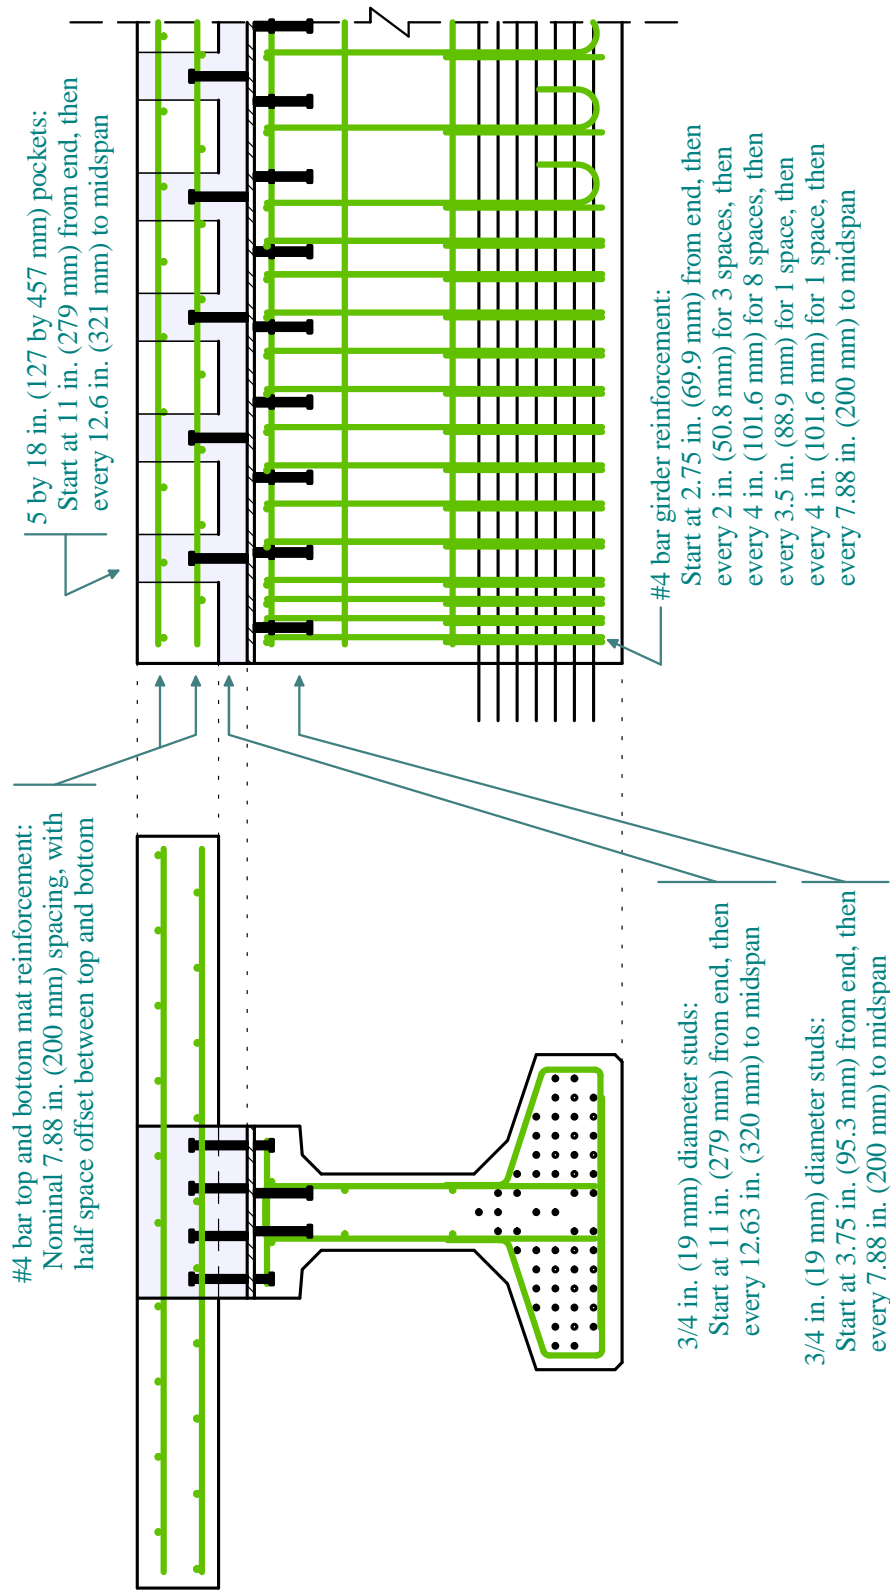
Illustration. Conventional composite connection: Longitudinal cross section of emulative steel girder connection.
